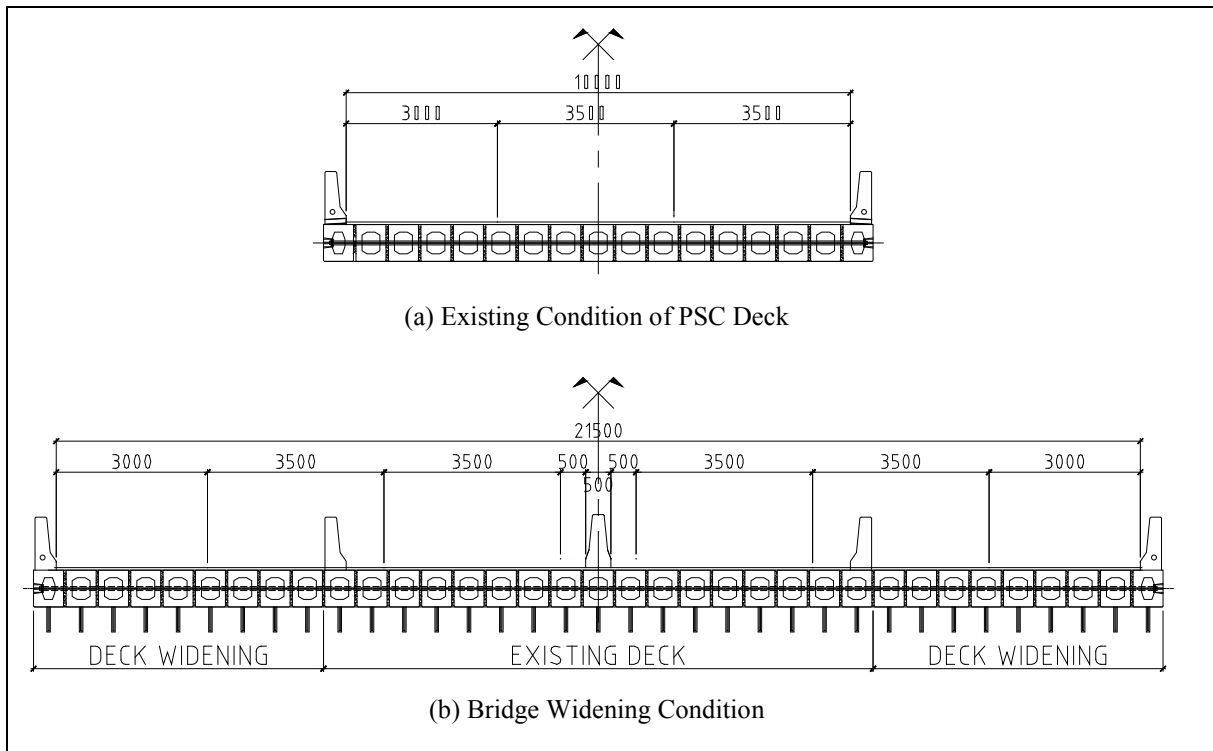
Typical Cross-Section of Widened Bridge for Full 4-Lane
